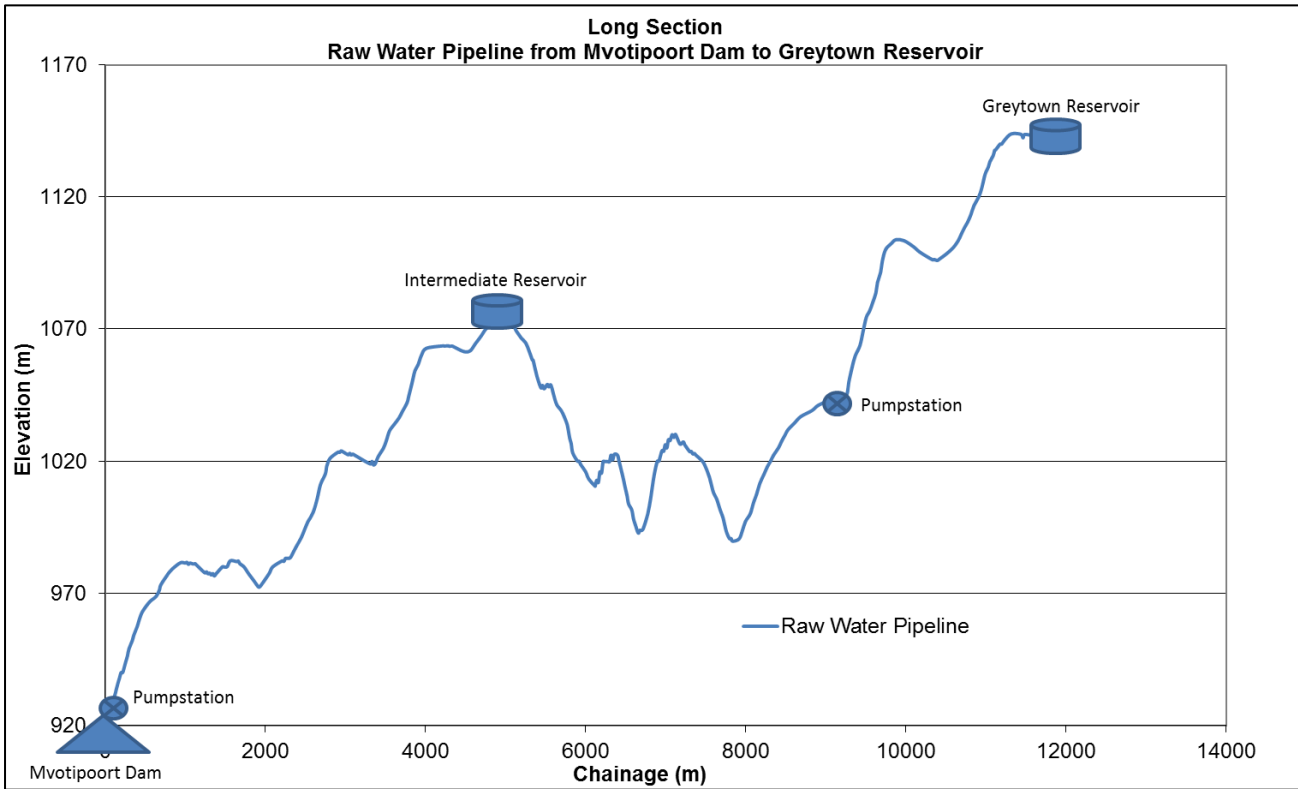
Long Section – Mvotipoort Dam to Greytown Reservoir
